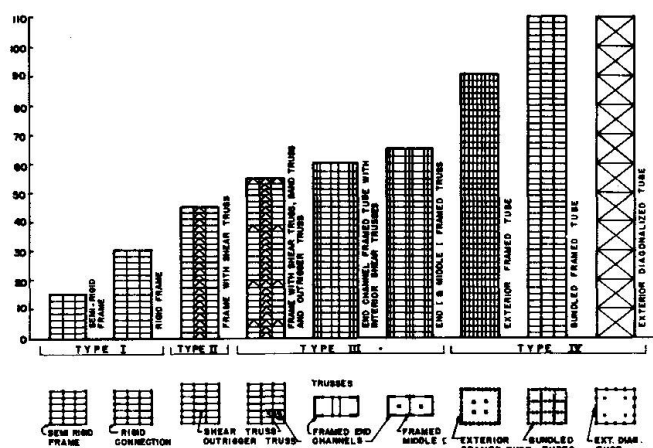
VARIOUS STRUCTURAL SYSTEMS
